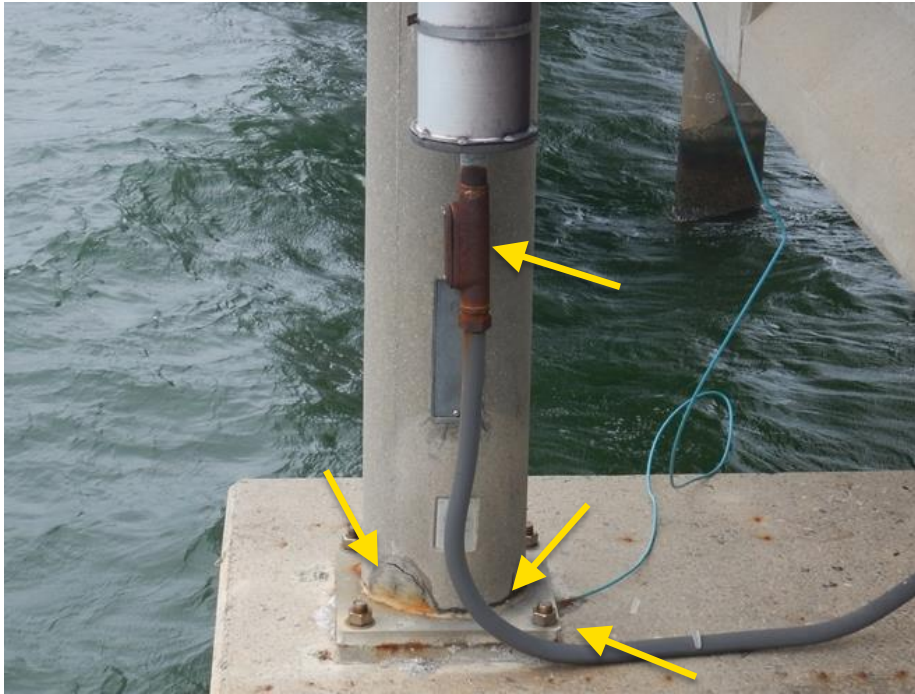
CSB149 Light Pole – Vertical Cracking and Failed Repair Near Baseplate, Corroded Conduit and Disconnected Cable (Looking South)
